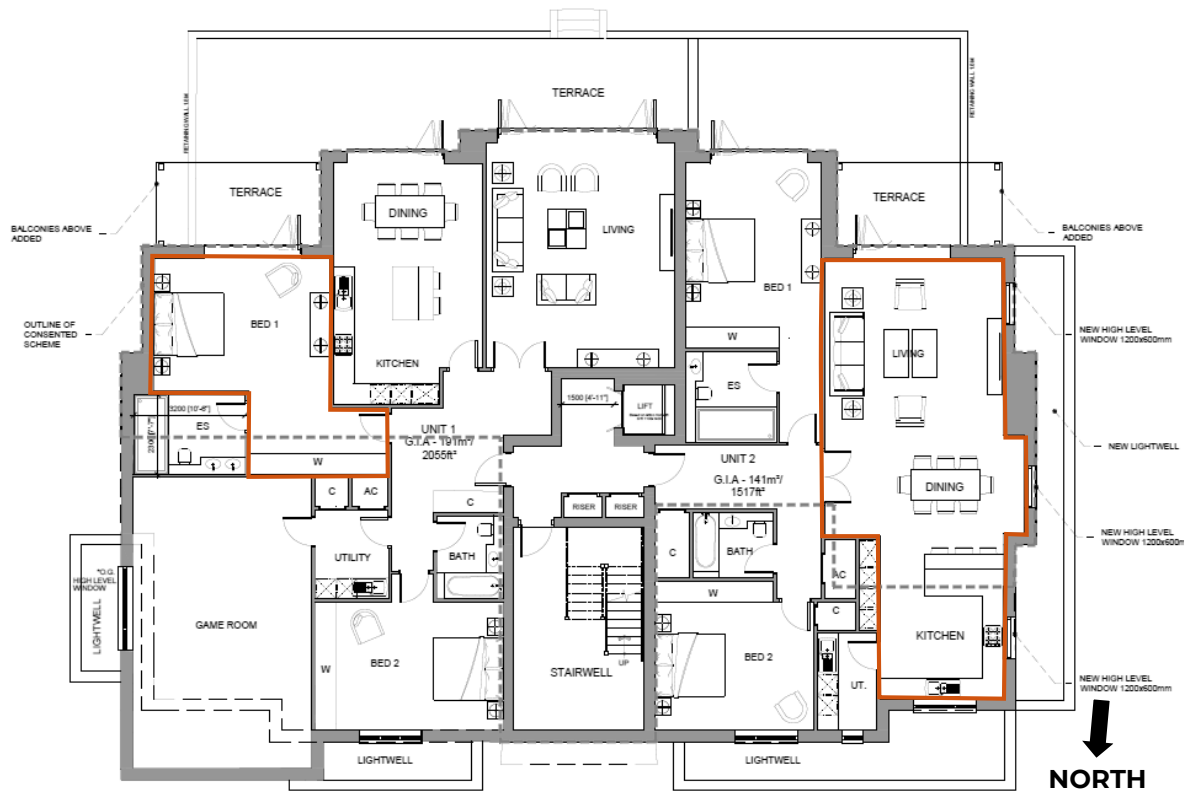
Lower Ground Floor Plan by Ascot Design; rooms assessed (red)
